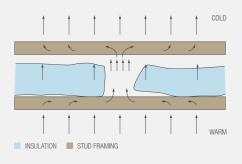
Air Bridge. Shrinkage or workmanship creates gaps around parts of the insulation.
